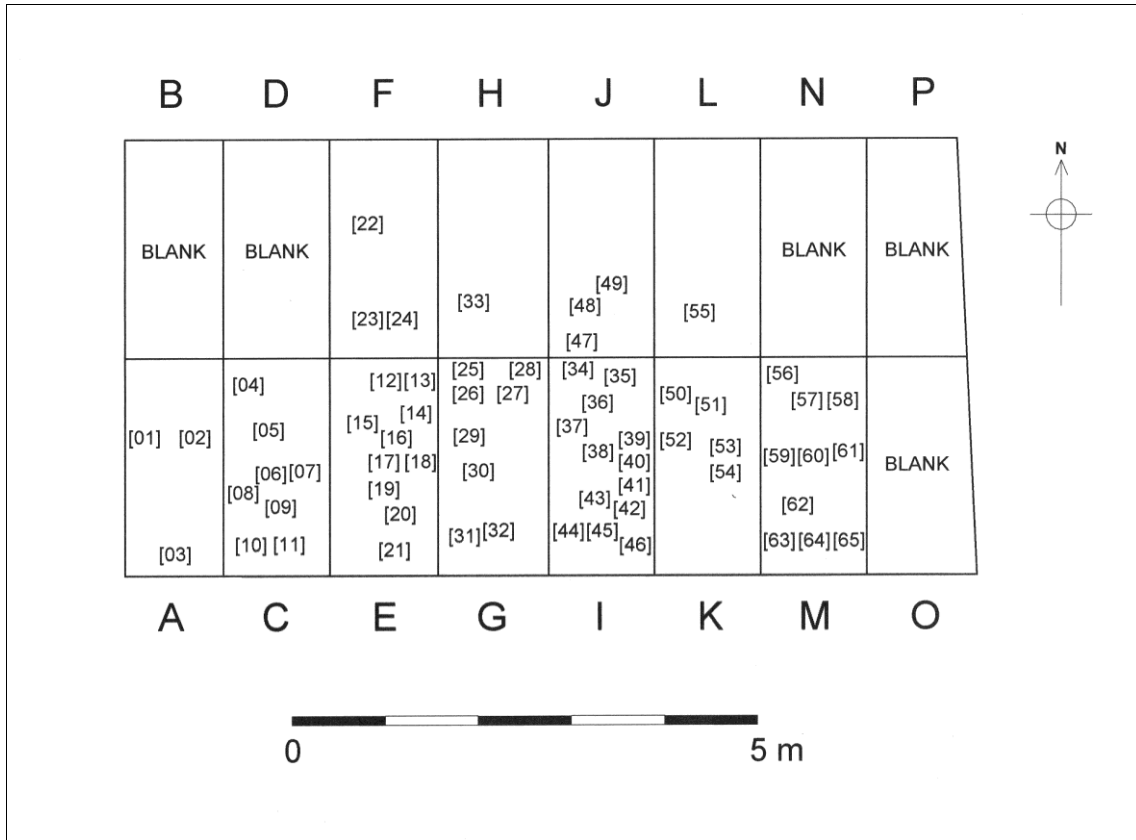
Plan of Willoughby Chapel roof showing locations of plumber' marks [01] to [65].
